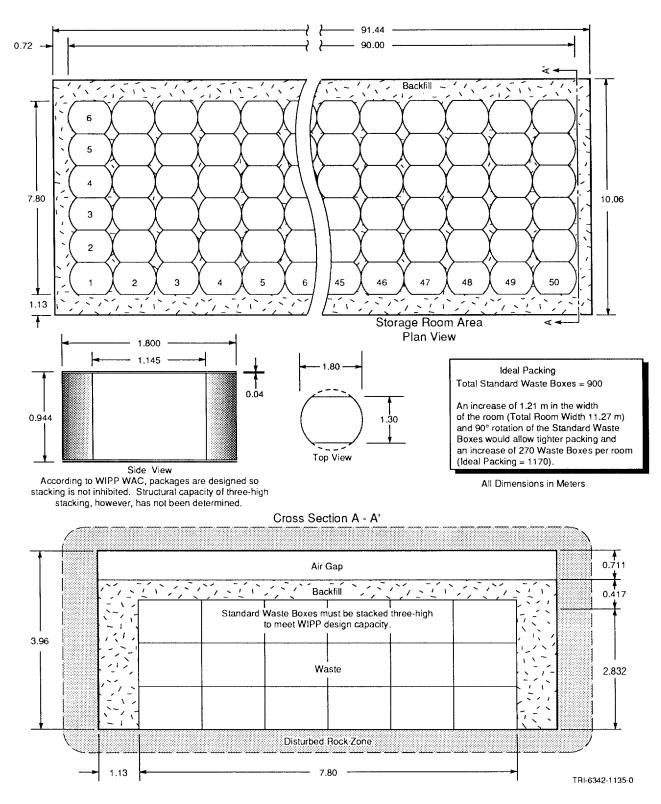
Ideal Packing of Standard Waste Boxes in Rooms and Drifts.
